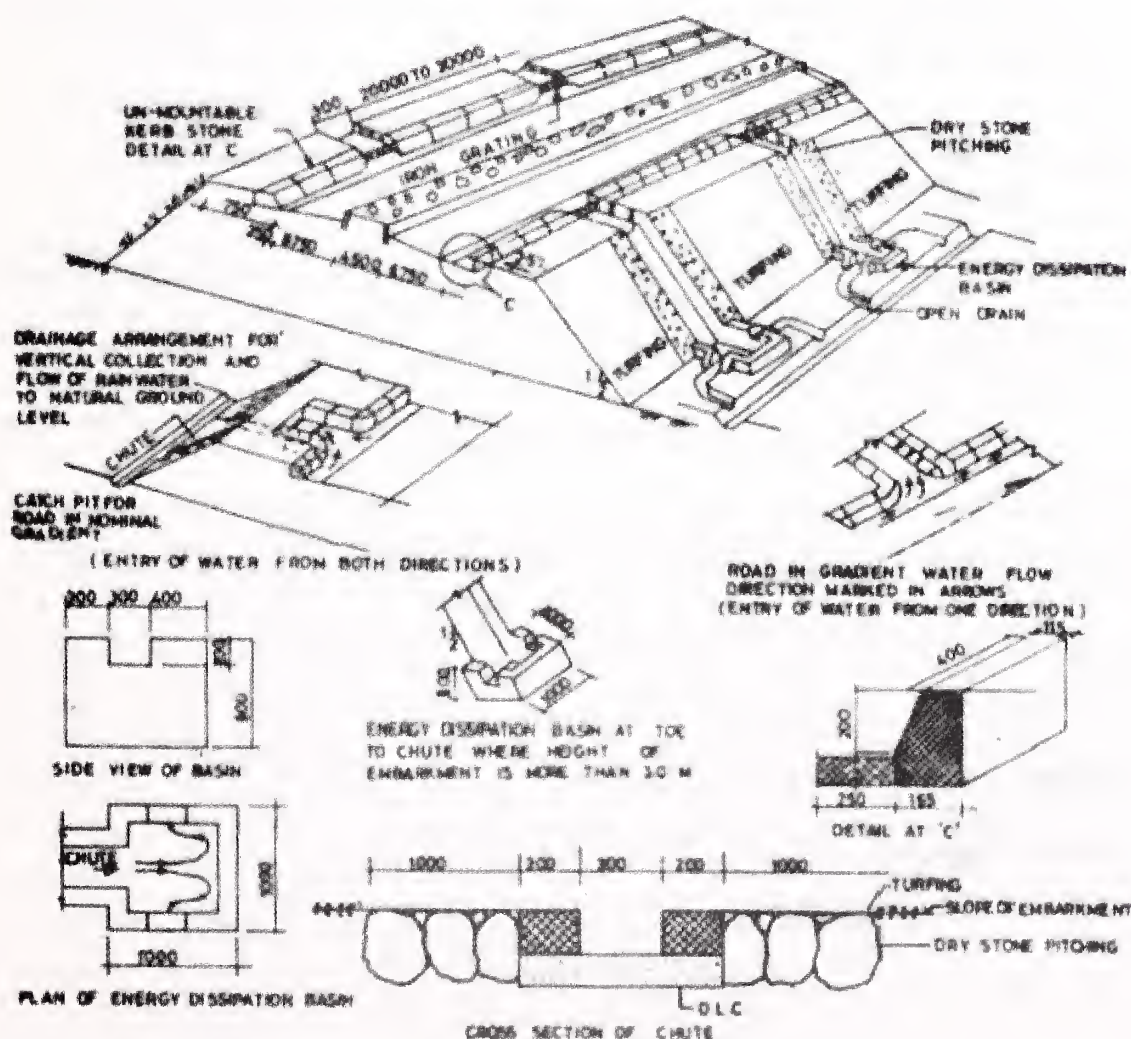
Perspective view of Standard Dual Carriageway Pavement with Paved shoulder Showing Drainage Arrangement for Collection and Flow of Surface Water to Natural Ground Level
